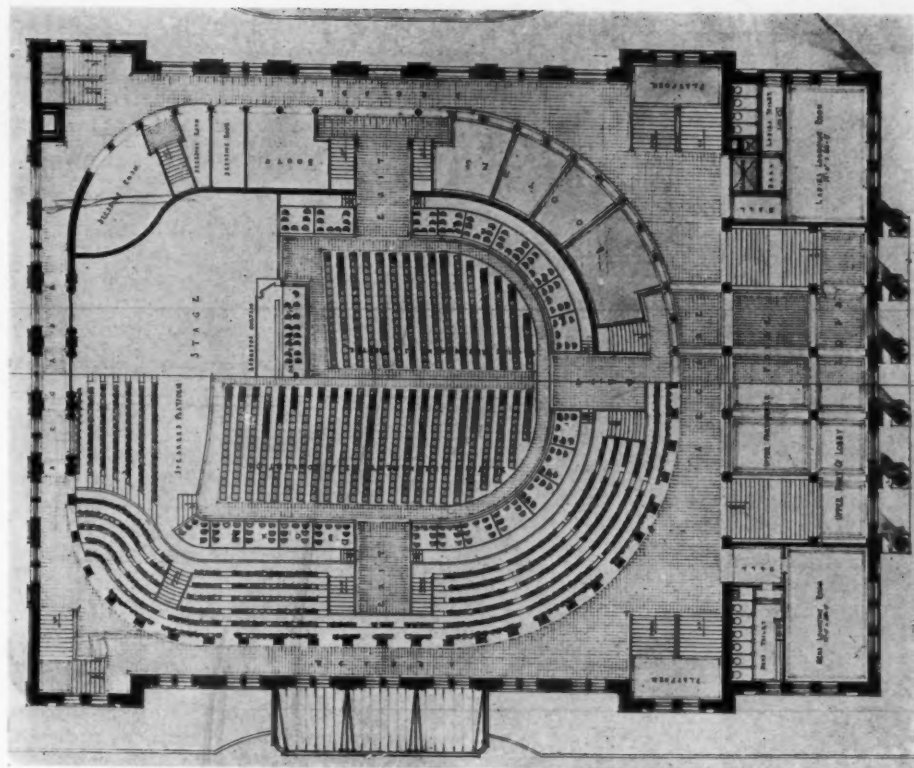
ONE-HALF PLAN GALLERY FLOOR—ONE-HALF PLAN SECOND FLOOR
